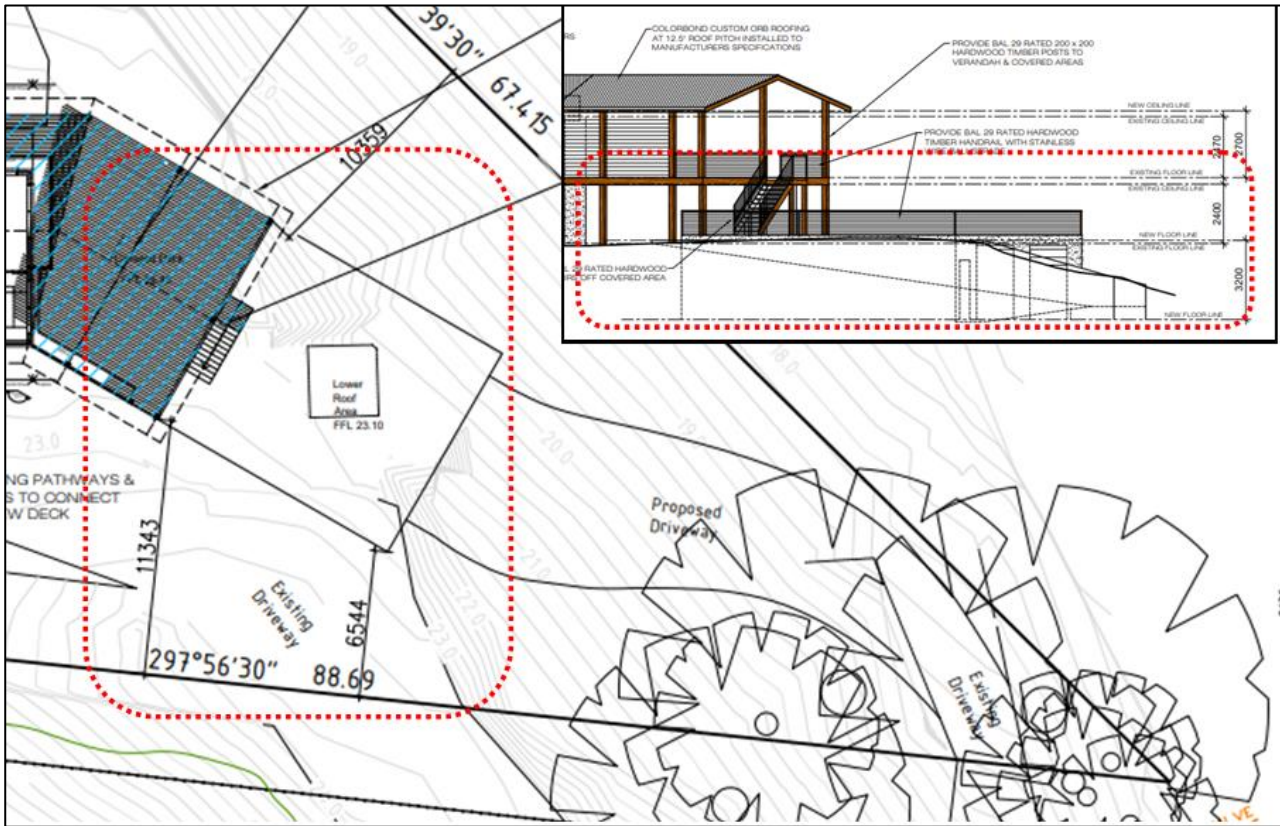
Proposed plans showing part of dwelling closets to street and how excavations will significantly reduce visibility from the streetscape
